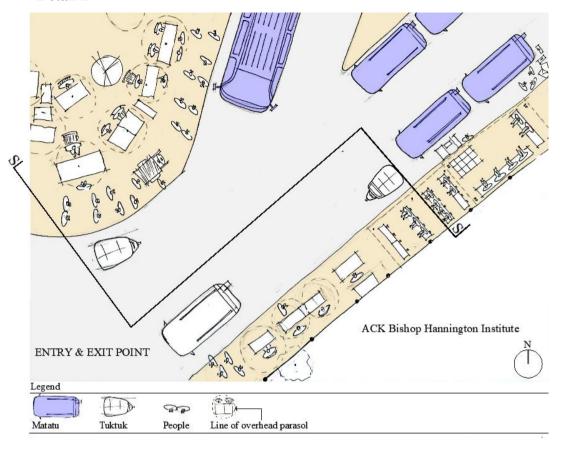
Part plan of Figure 61, Detail B, illustrating vendors and matatu areas. Source: Author 2022
